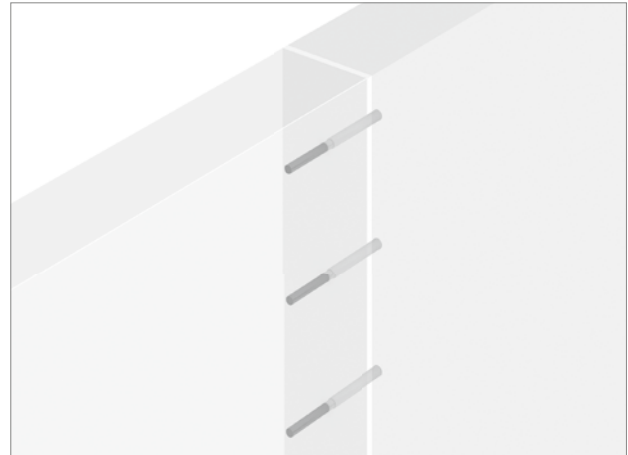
Schöck Stacon®: wall-wall connection (front-front)
